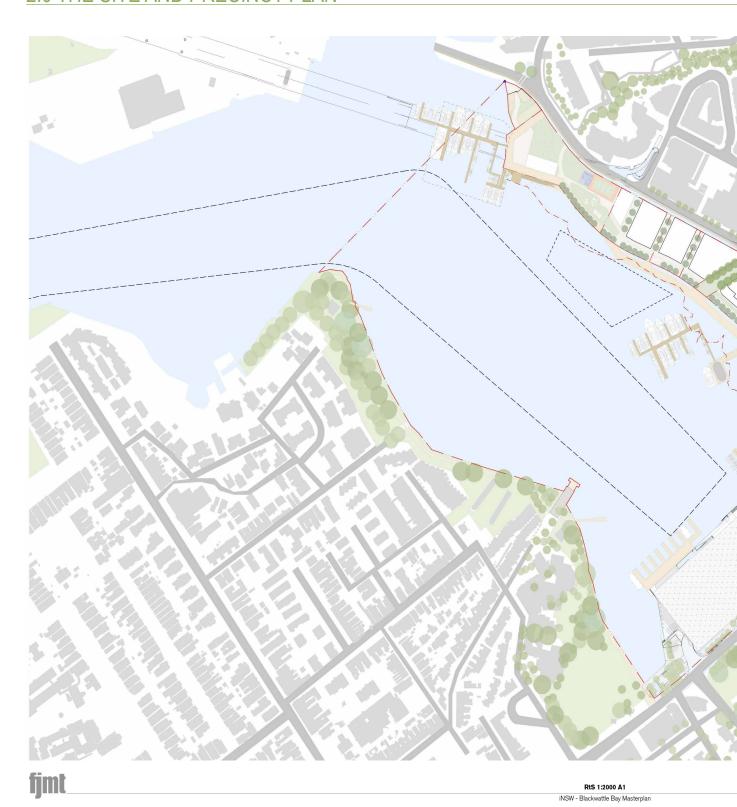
Precinct Plan. (source fjmtstudio)
